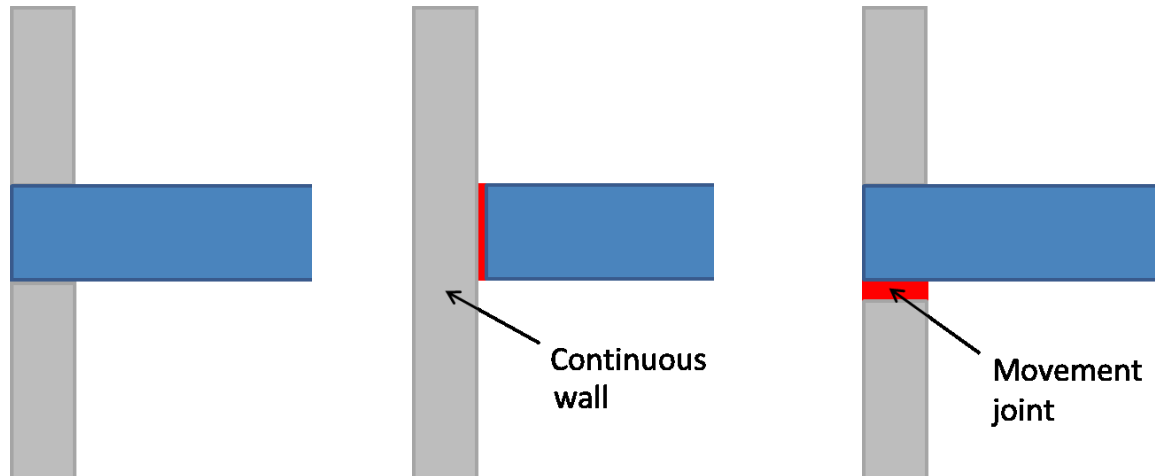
Loading bearing back wall (left), self-supporting continuous back wall (middle), Infill back wall (right)
